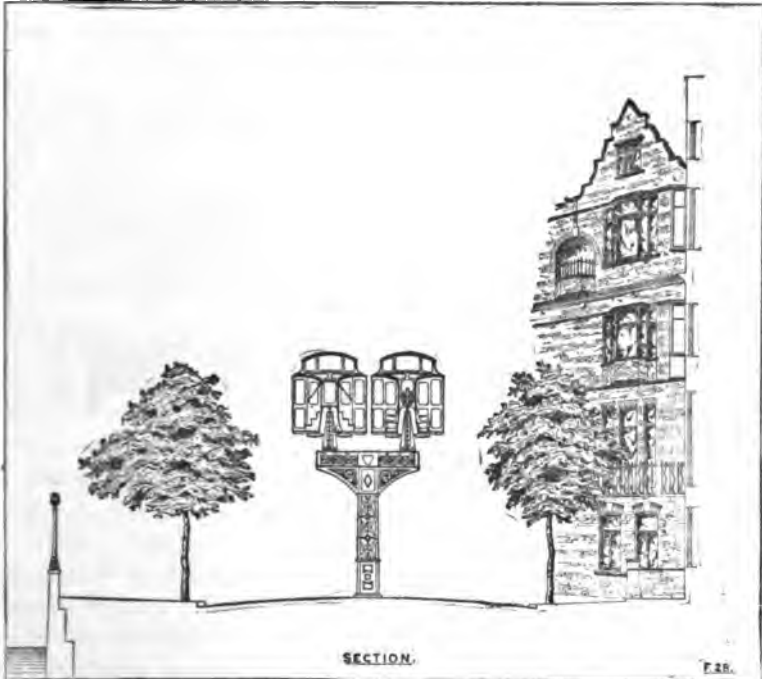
PROPOSED METROPOLITAN RAILWAY FOR CHELSEA EMBANKMENT, LONDON.
